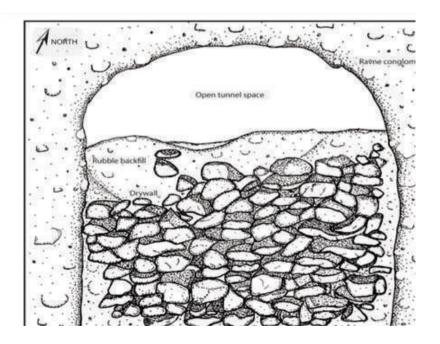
The second drywall (drywall 2) discovered in Ravne 3 tunnels during 2019 (drawing made by R. Hoyle, 2020)
